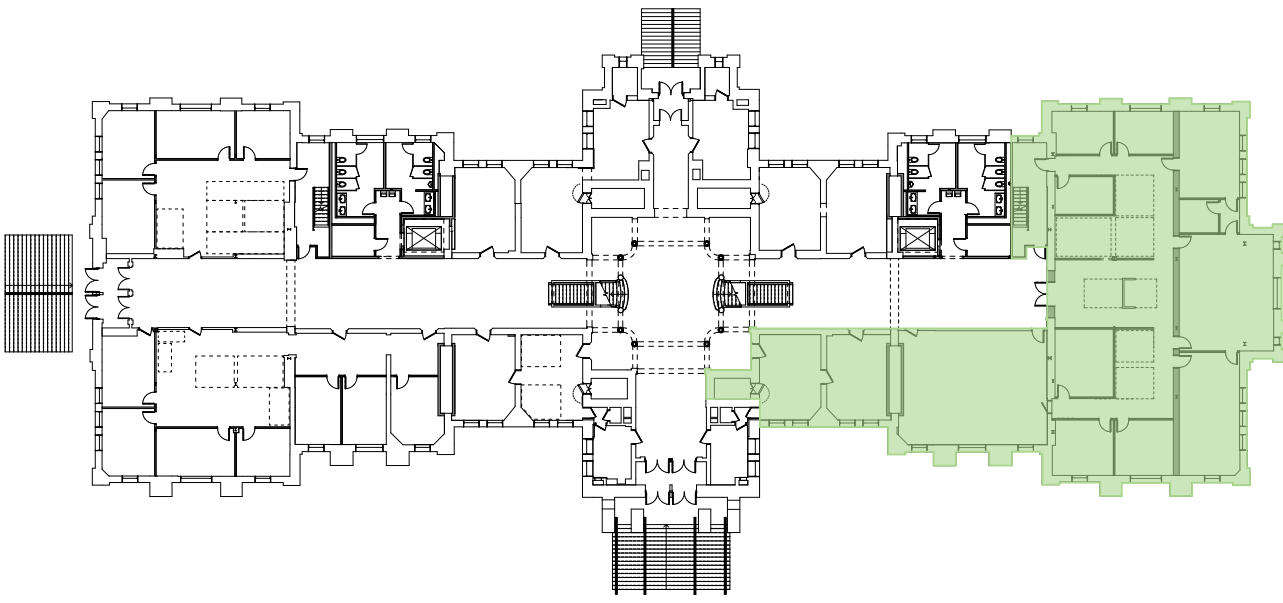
Proposed Space Allocation: Governor - First Floor [Capitol]
